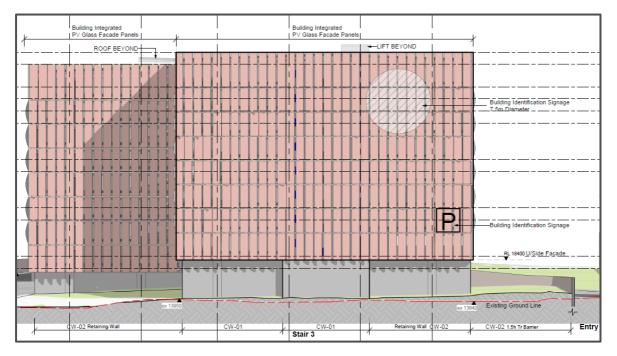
| Proposed Northern Elevation Signage (Source: Applicant's Architectural Plans)
